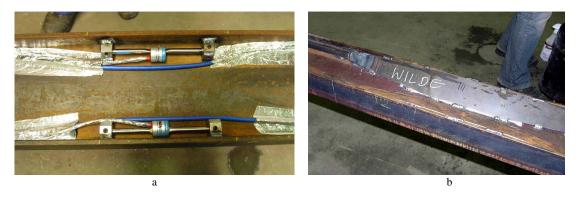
a. Strain gages installed on IPE160 profile CSC - column reinforcement; b. Steel plate protecting measuring points
